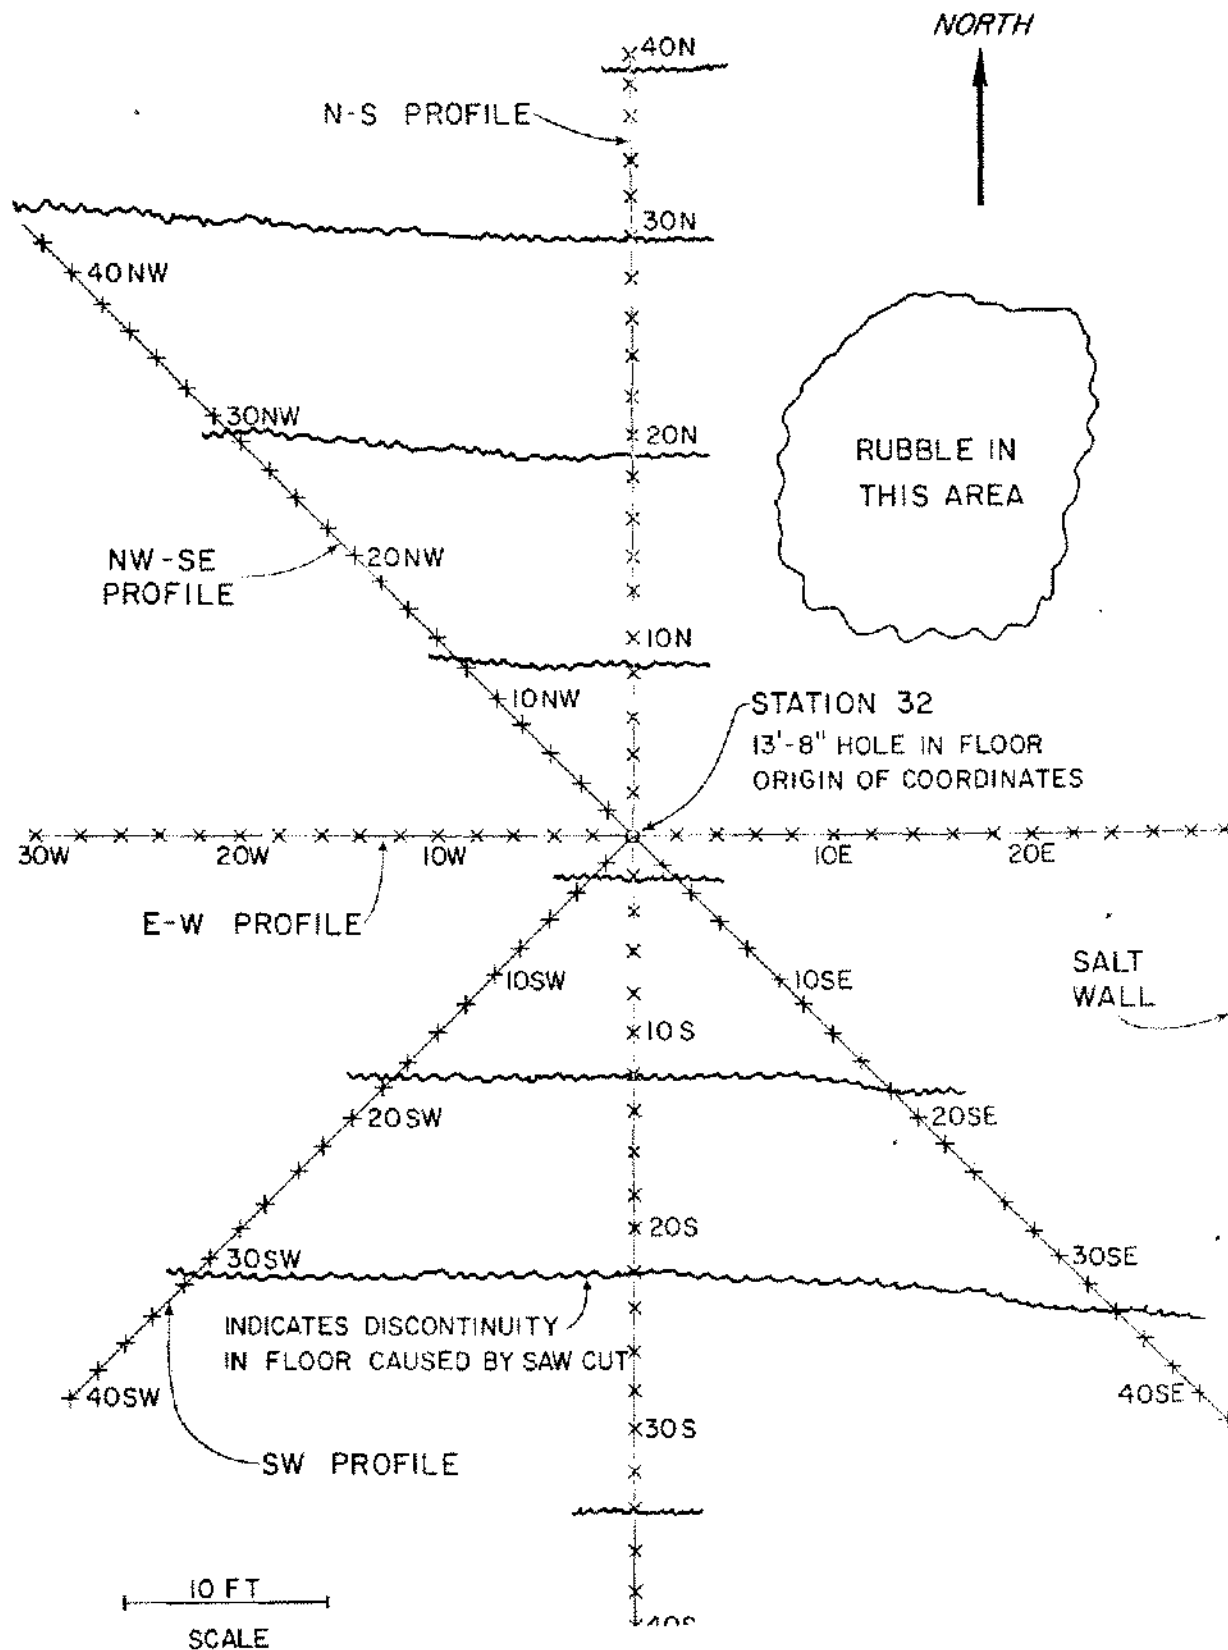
Layout of Station for Detailed Profiling of the Tunnel beneath the salt floor.
